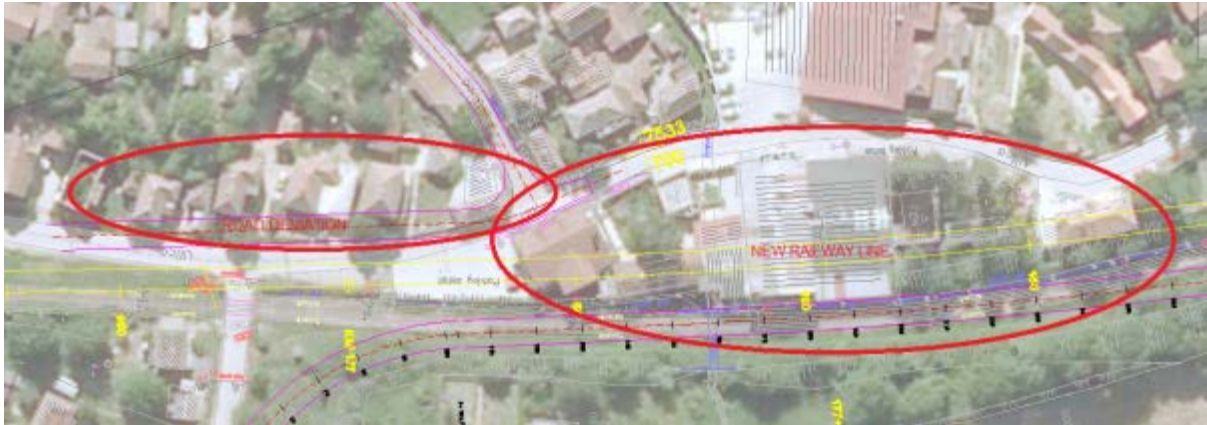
Residential and commercial buildings that are on the route of the new railway line
